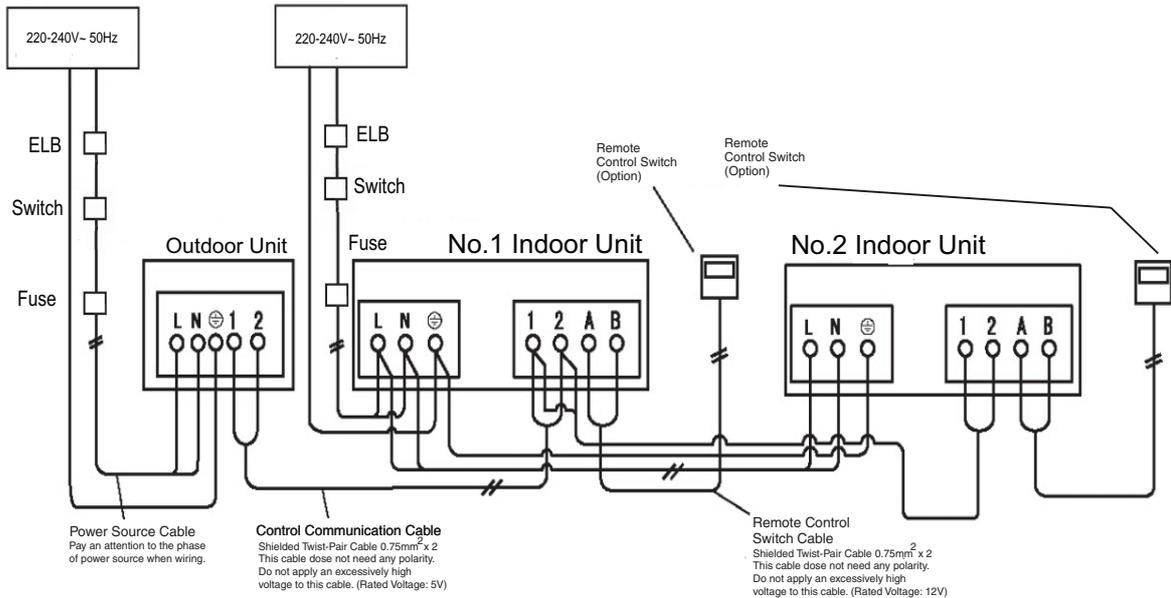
Wiring Connection for Indoor & Outdoor (1 PHASE)
